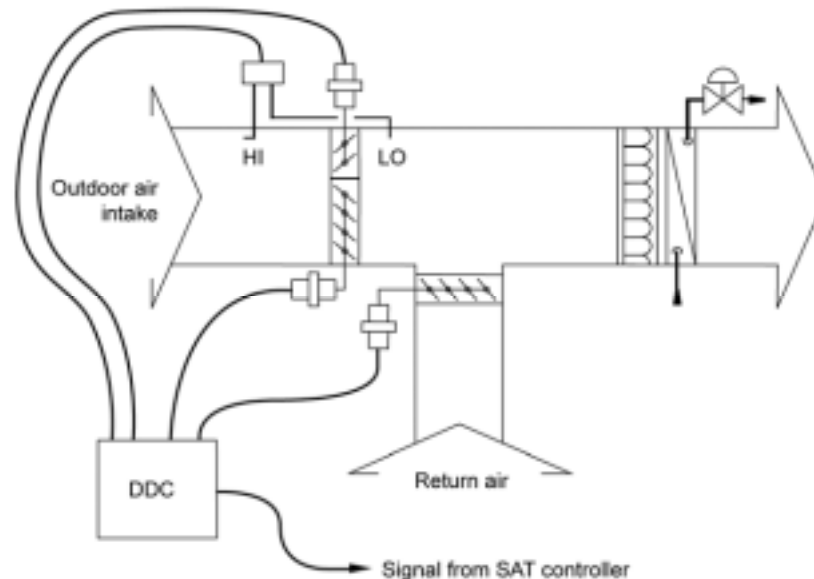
Minimum Outdoor Air Damper with Pressure Control
